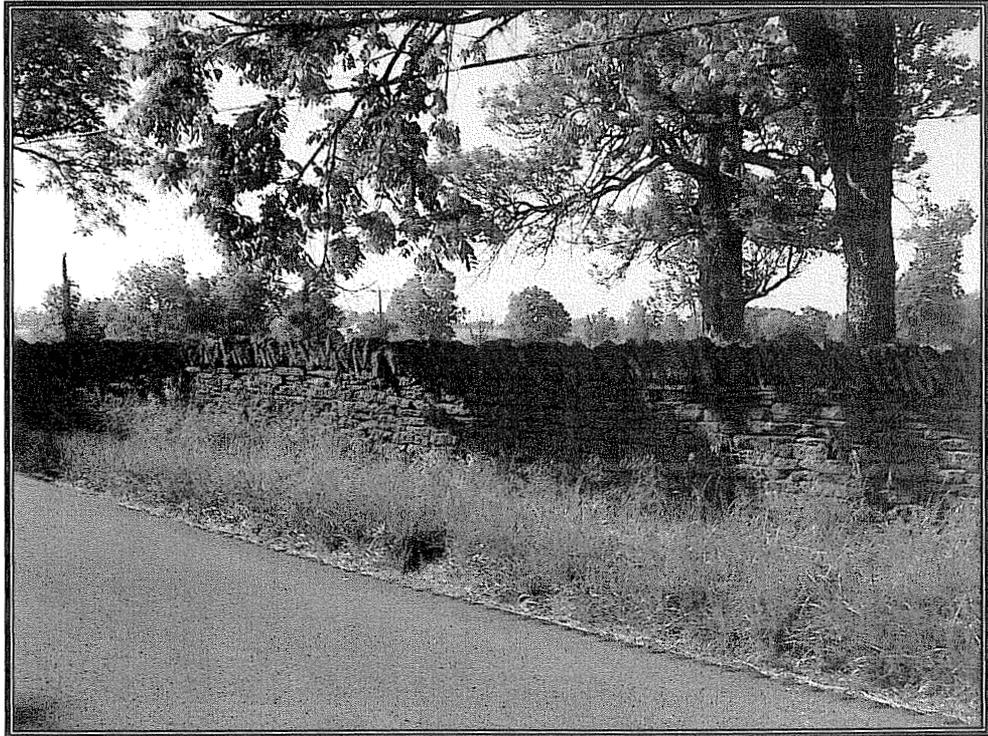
FS 7, dry-laid rock wall with horizontal coping.
